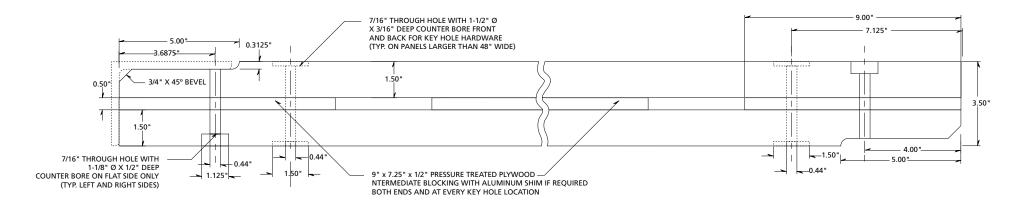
/2 x 3-1/2" x 3/16" POST ASSEMBLY SIDE ELEVATION B'-B
